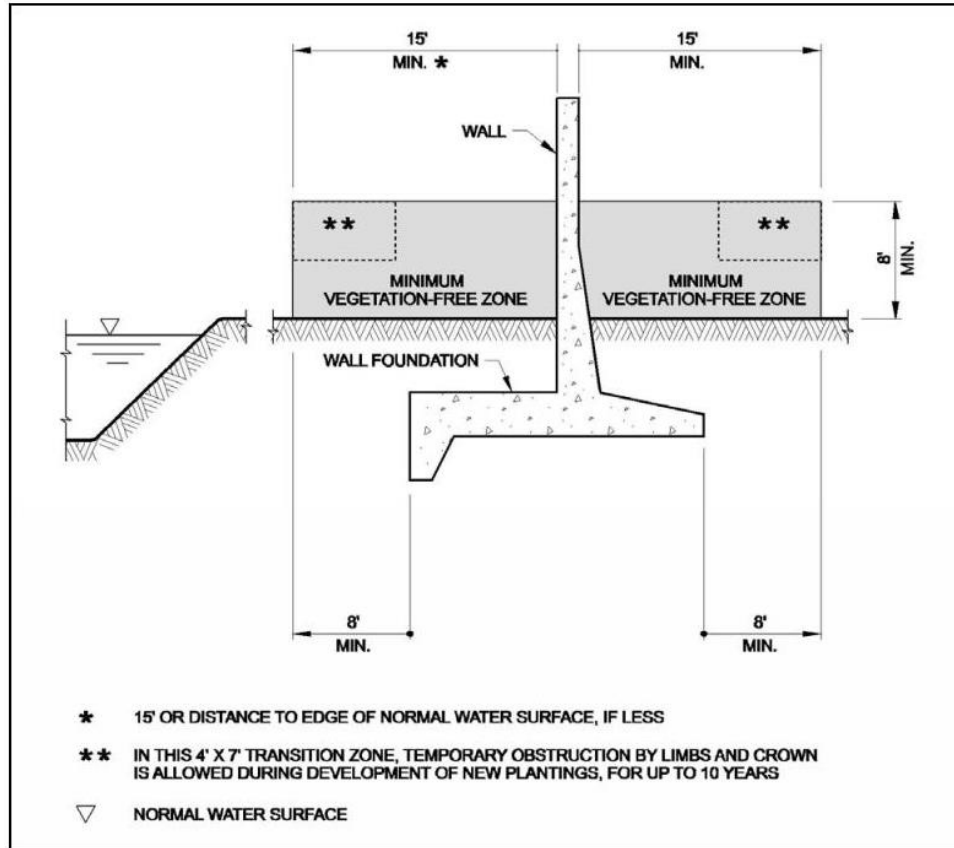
Typical Vegetation-Free Zone Configuration at Floodwall
